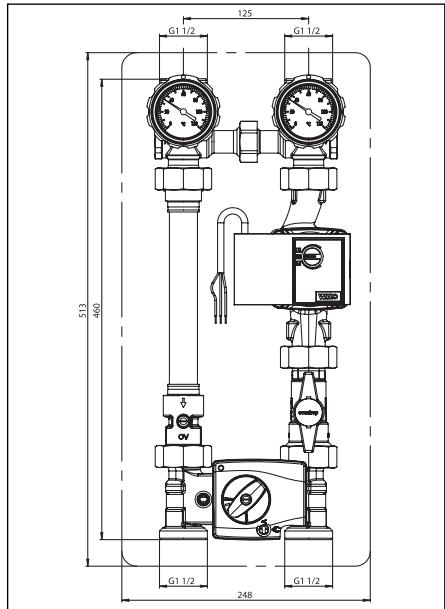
Pump group DN 25 180 mm with pump ball valve
